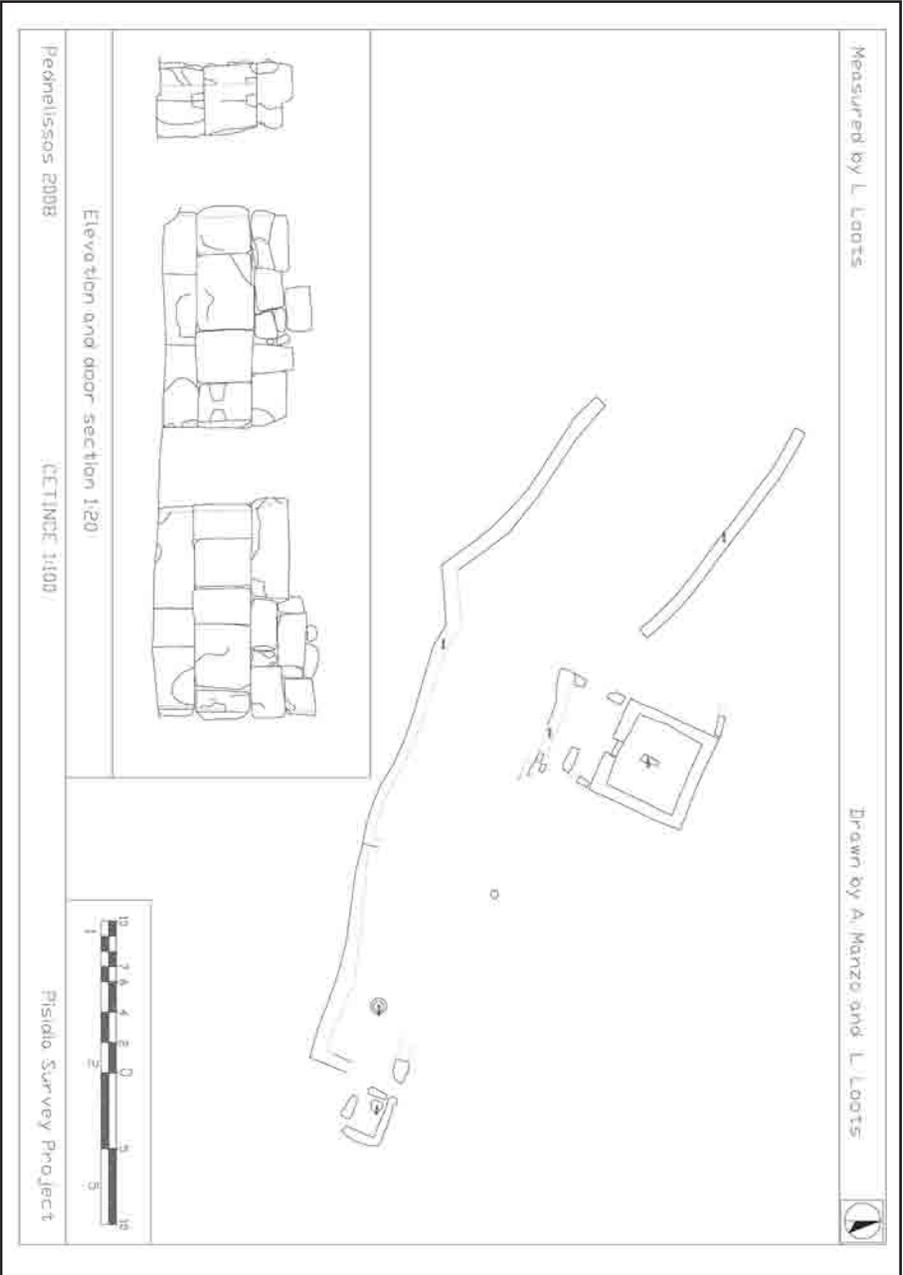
Hasdümen, Çetince Mahallesi, Sobulan Mevkii, plan and elevation of the so-called olive oil workshop
